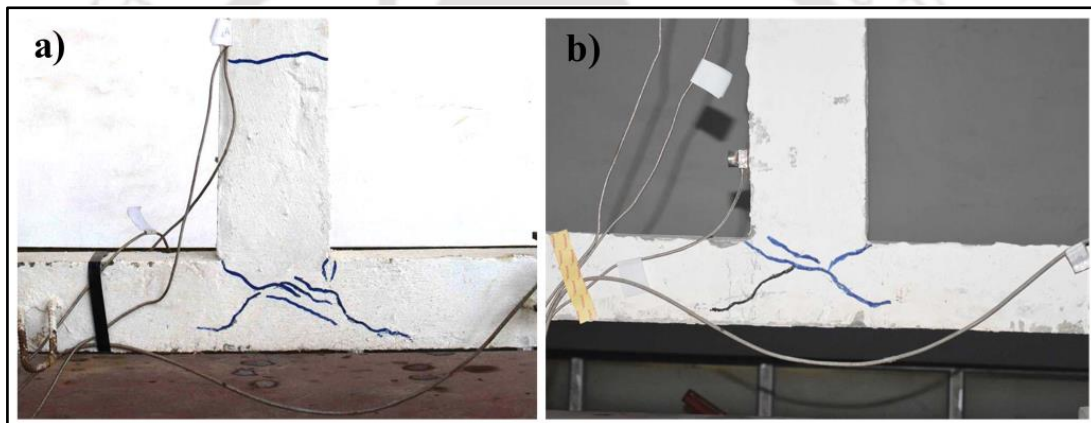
Crack pattern and failure mechanism of specimens: a) BSNS, and b) BSS
